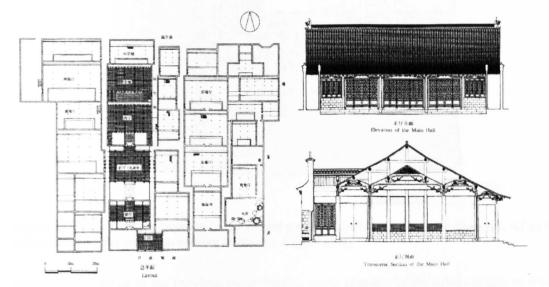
The plan layout, elevation and section of a traditional house complex in the city (The Real Estate Management Bureau of Suzhou, 2004, p218-9)
